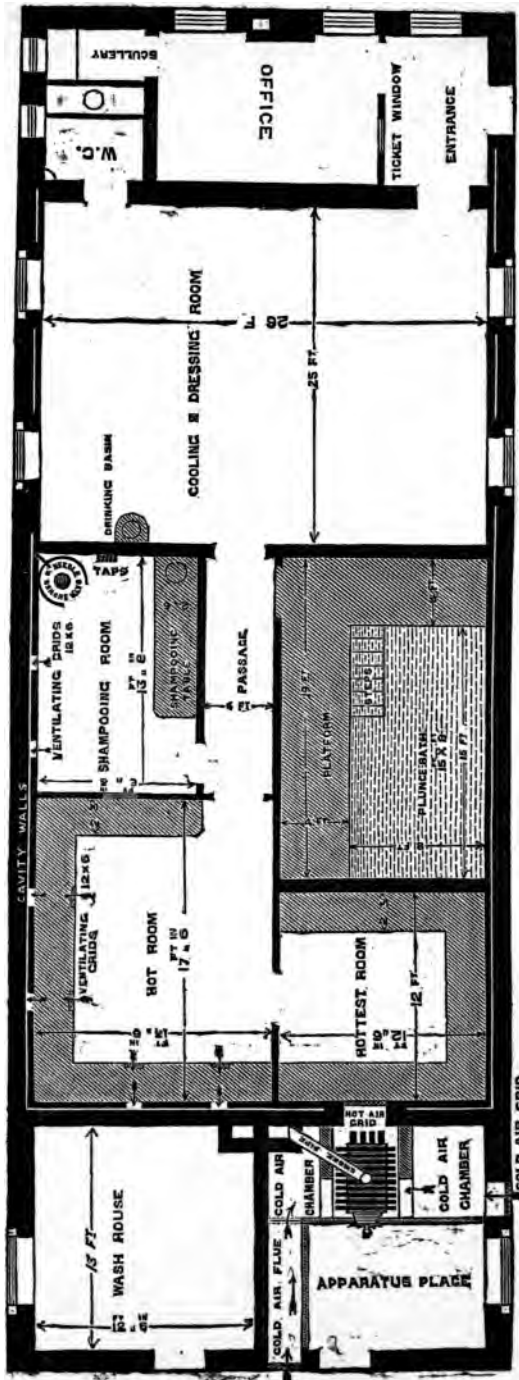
PLAN OF TURKISH BATH WITH PLUNGE.
